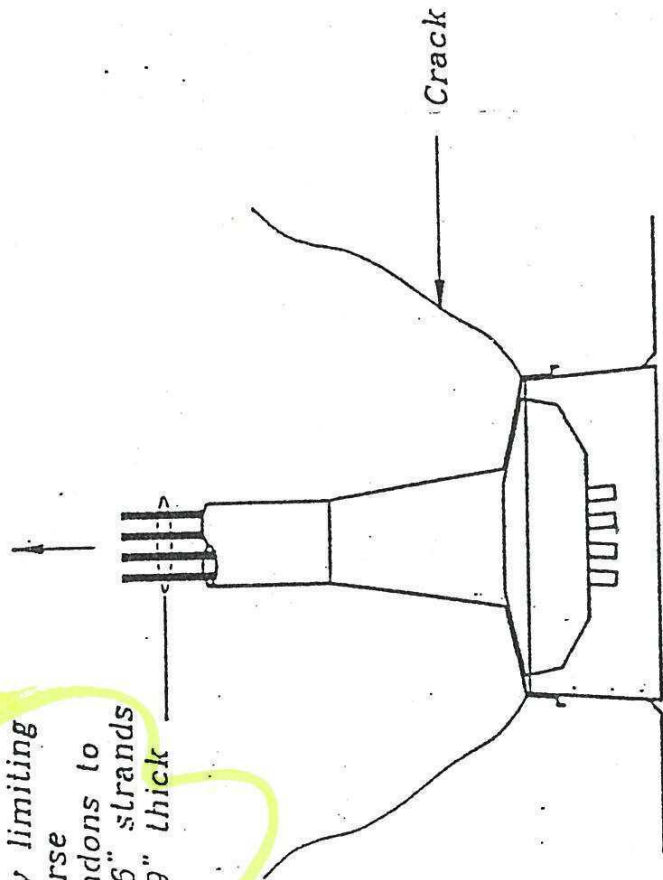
Cracking at Transverse Post-Tensioning Anchorage
